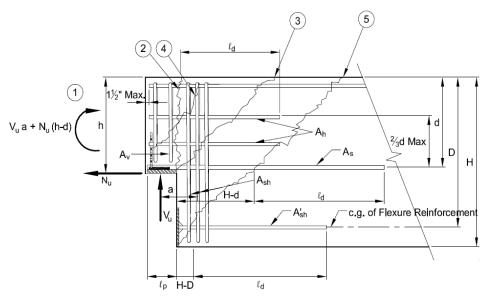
Potential Failure Modes and Required Reinforcement in Dapped-end Connections
